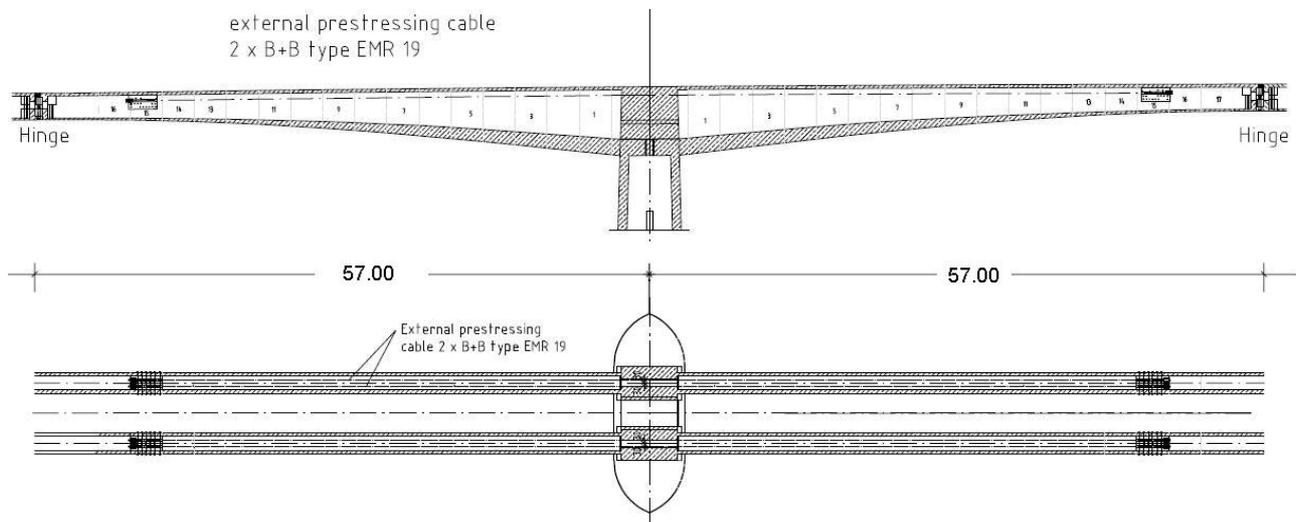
Reinforcing the cantilever beams with external longitudinal tendons
